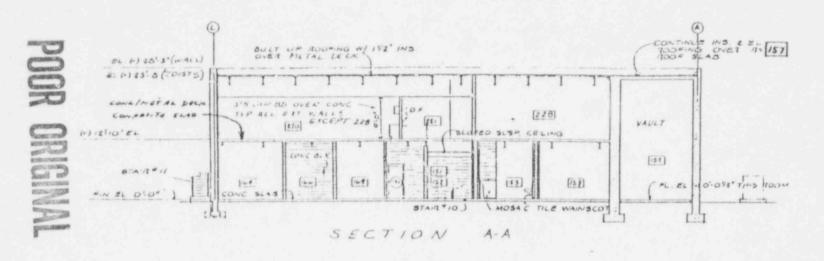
(a) BUILDING SECTION (EAST-WEST)
